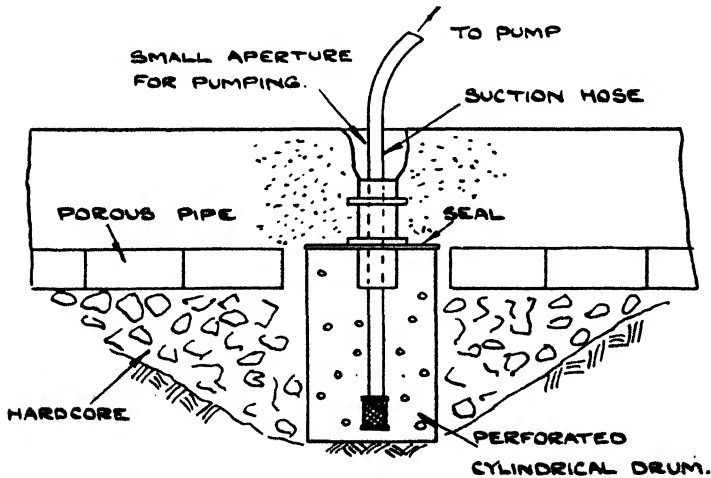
TYPICAL SUMP AND SUCTION PIPE TO PUMP
